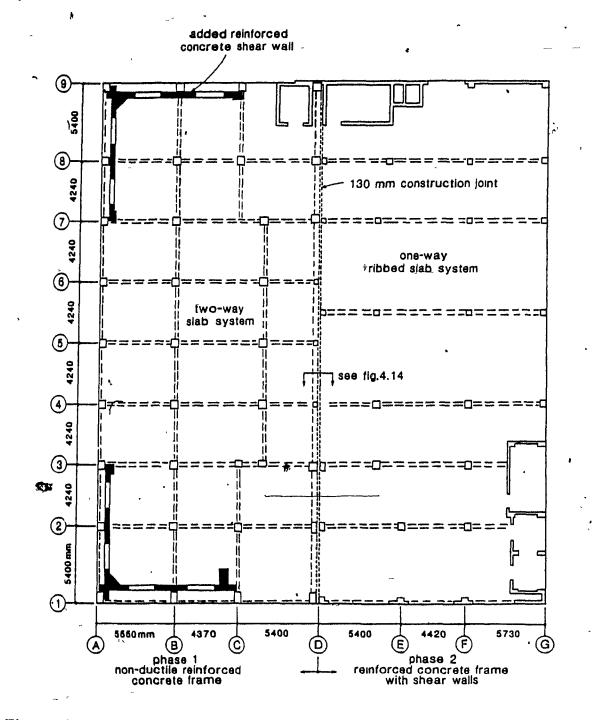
Plan View of Eight-Storey Office Building at the Corner of Hasting and Setmour in Vancouver.
